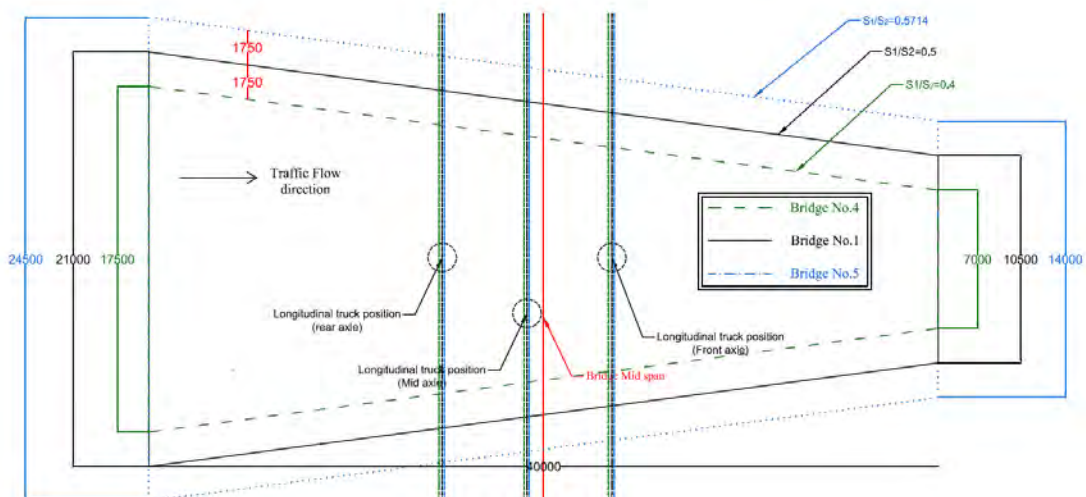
Bridges B1, B4, and B5 plan view - flexure
